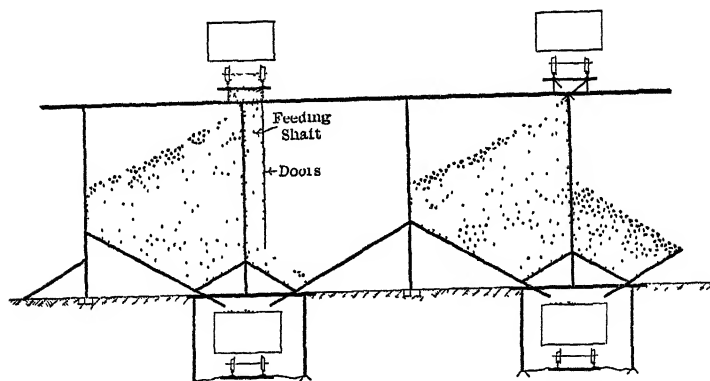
BIN-AND-TUNNEL TYPE OF STORAGE. STOCKING FROM RAILROAD CARS ON TOP OF BINS. RELOADING BY GRAVITY INTO CARS OR CONVEYORS IN TUNNELS.
